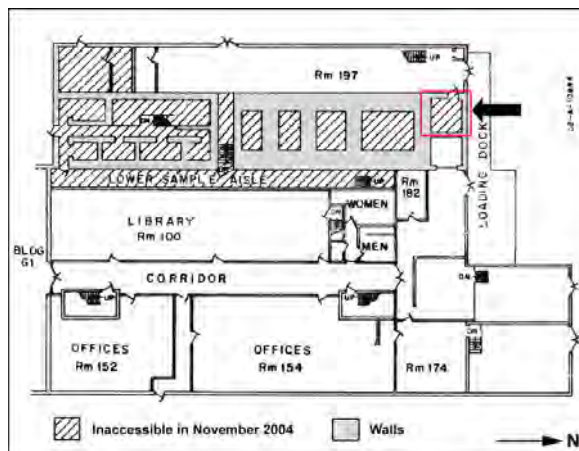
G2 337-Foot Level, Decontaminating Chamber
